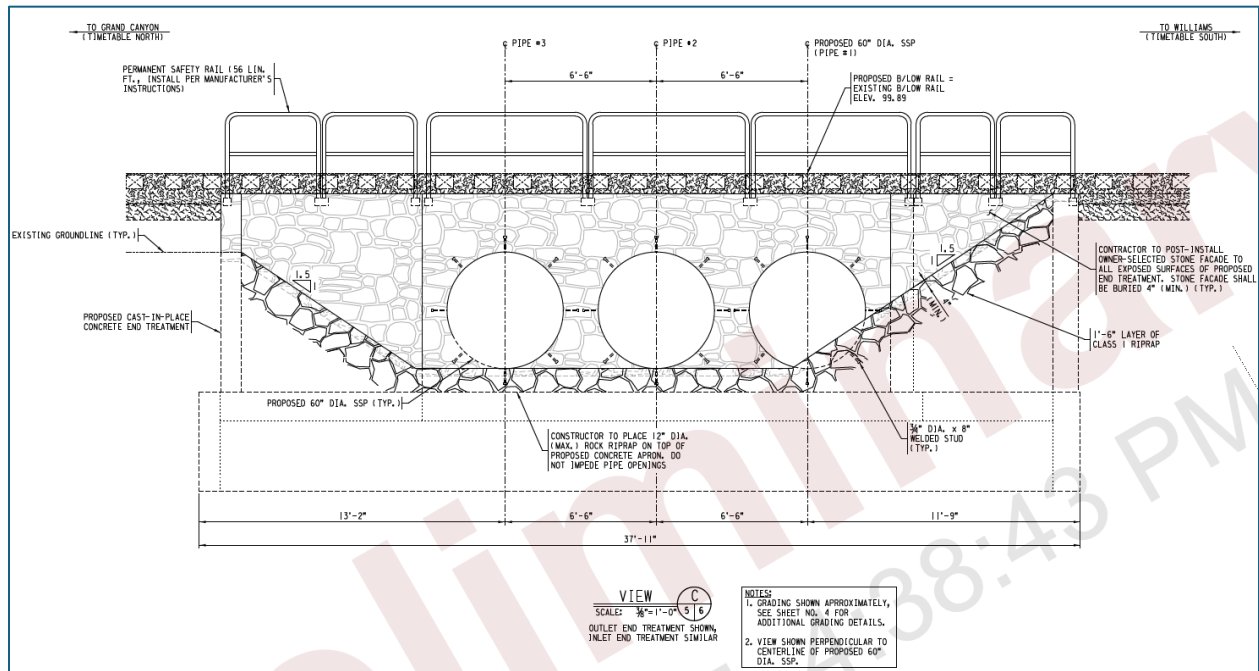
Example of Proposed Triple Steel Pipe Culvert Structure
